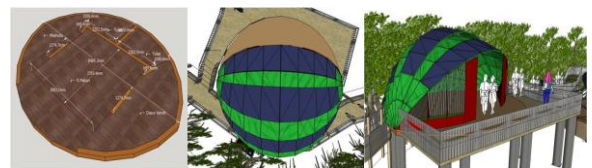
(Left) stage building plans; (Middle) top view; (Right) the perspective of stage building from the lake.
